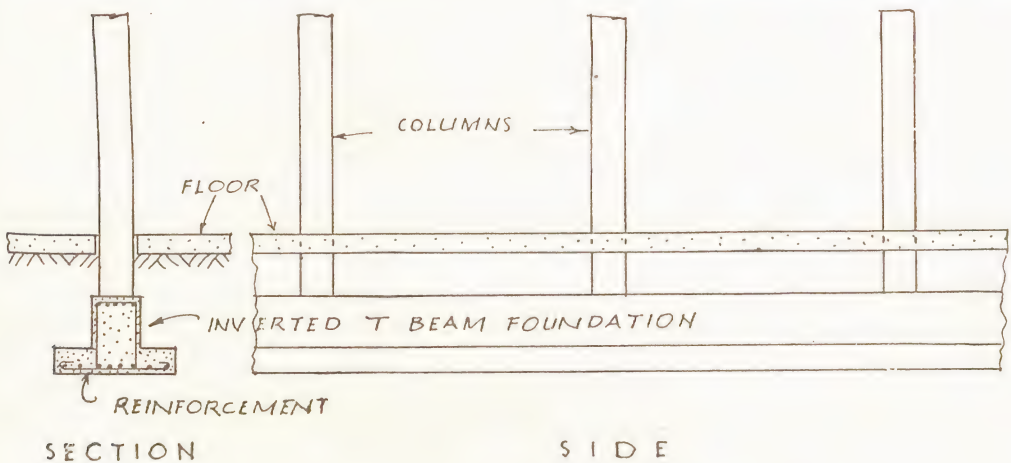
Foundation to columns. Inverted tee beam in concrete.
